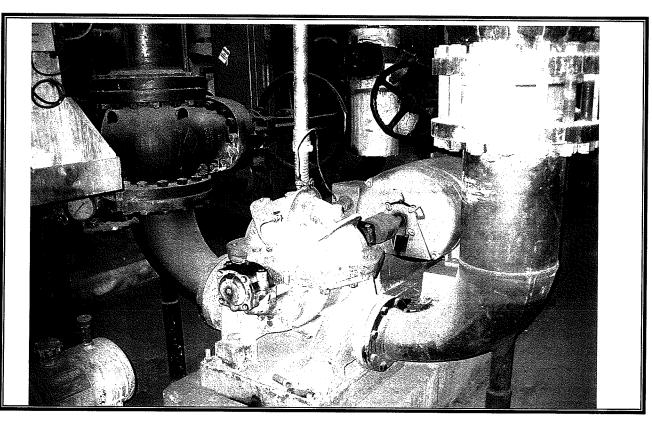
Photo Date 12/05/06 McCurdy Building Front view of chilled water and condenser water pumps
